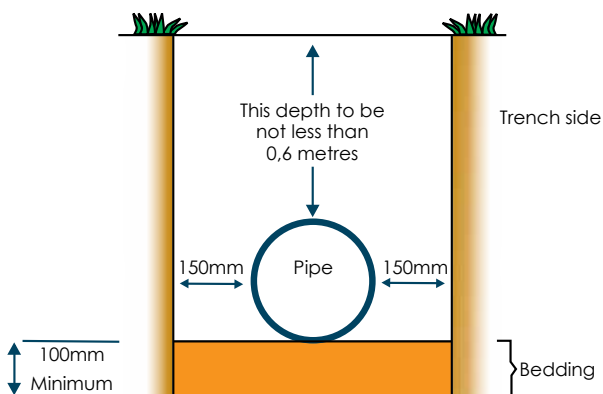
TRENCH INSTALLATION DETAILS
